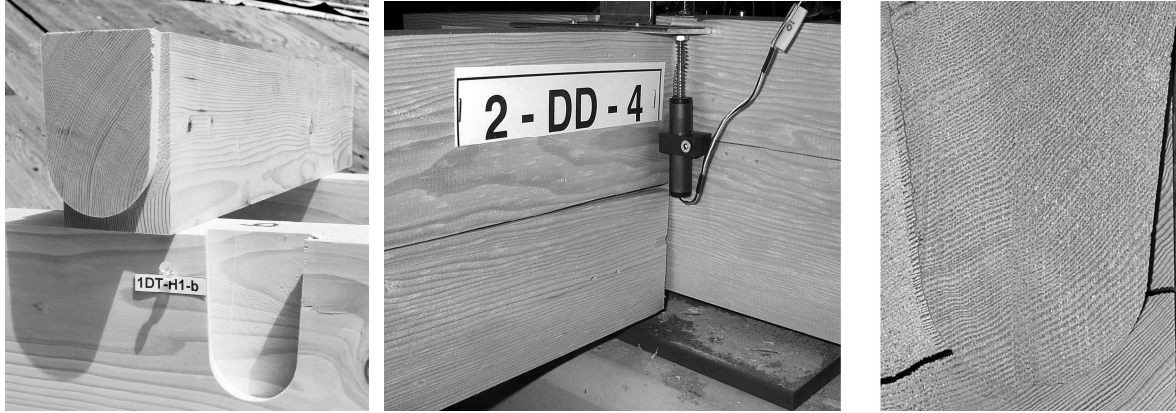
Rounded dovetail joint: specimen (left) and typical failure (right)
